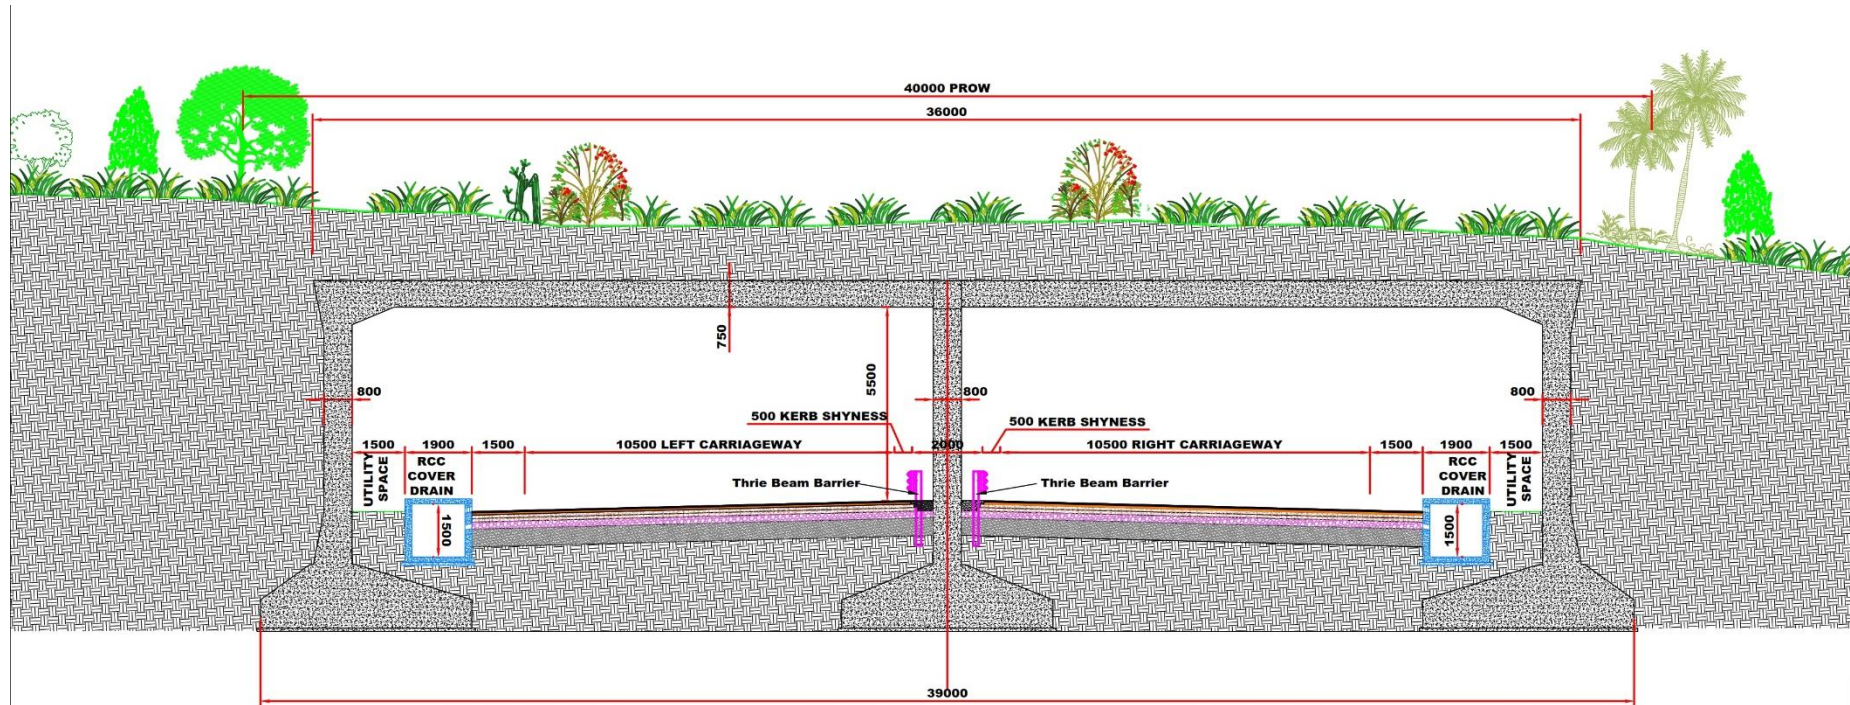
(d): CROSS SECTION OF BRIDGE AT CH.-56+178
